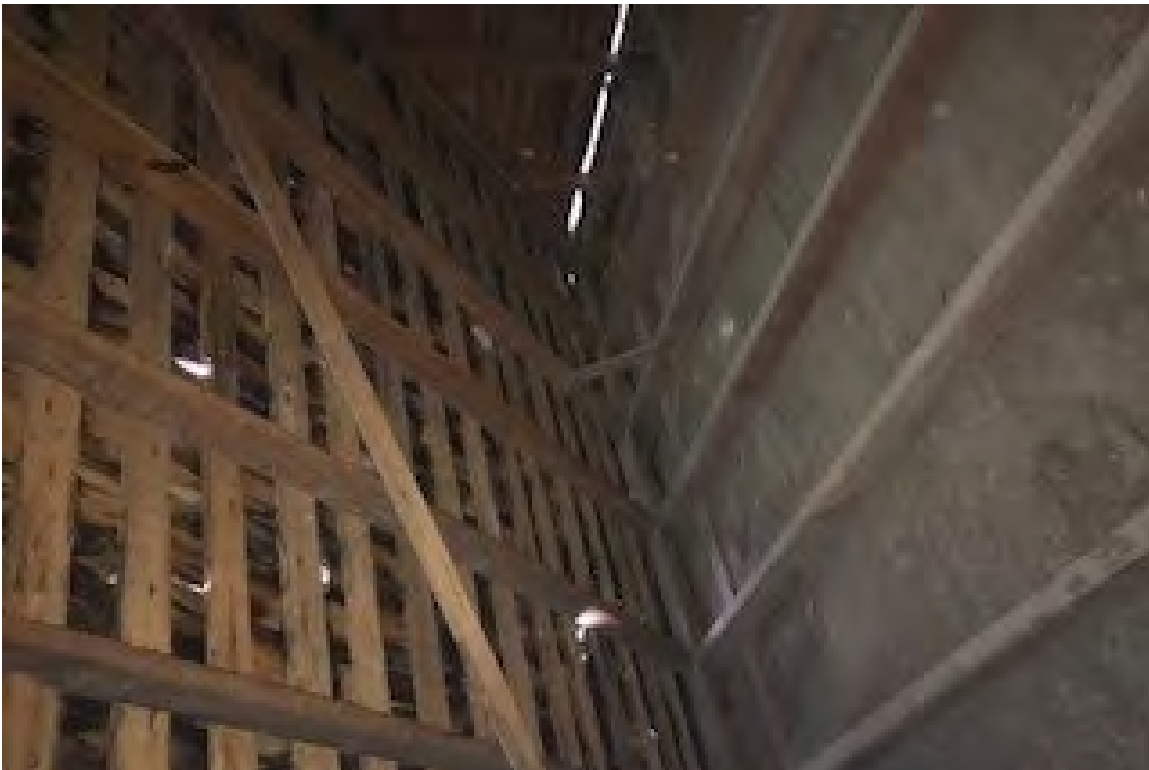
Epps-McGill Farmhouse - PHASE 01: View of ceiling joists and roof battens (Kalen McNabb 2020).
